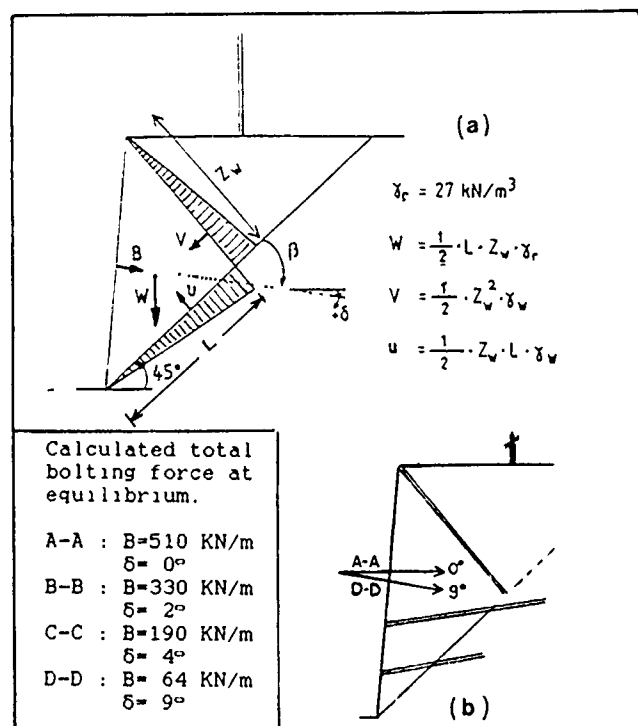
Illustration of (a) assumed slope geometry forces for bolt design (active pressure from upper slope-half considered equal to zero); (b) recommended bolt direction and position of drainage holes
